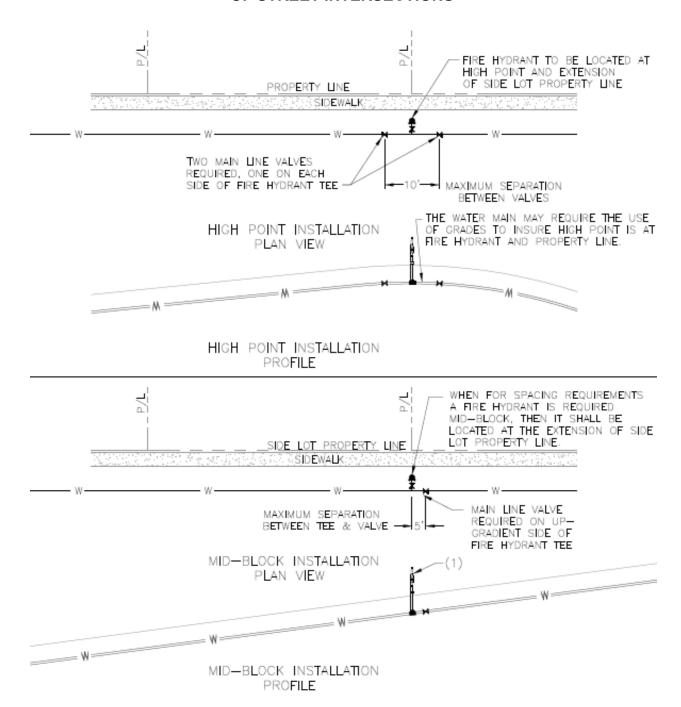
WATER MAIN VALVE AND FIRE HYDRANT LOCATIONS OUTSIDE OF STREET INTERSECTIONS
